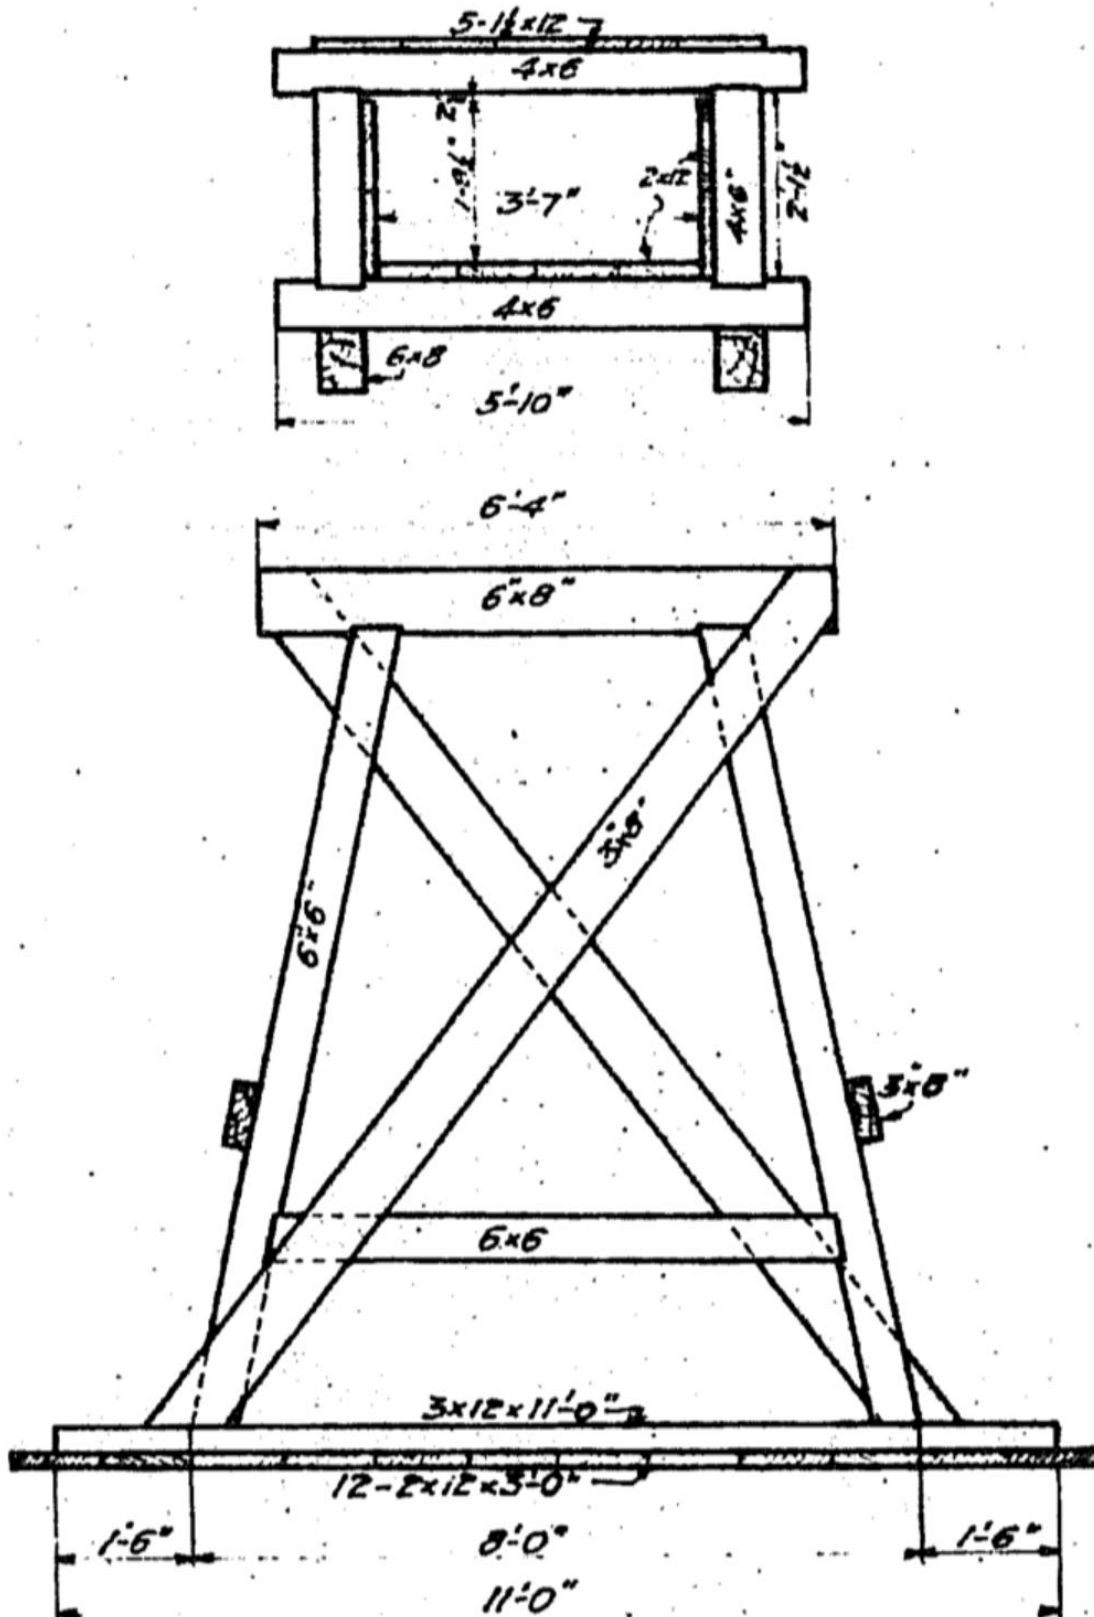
Cross Section of Typical Elevated Trestle for 4'x2' Flume
